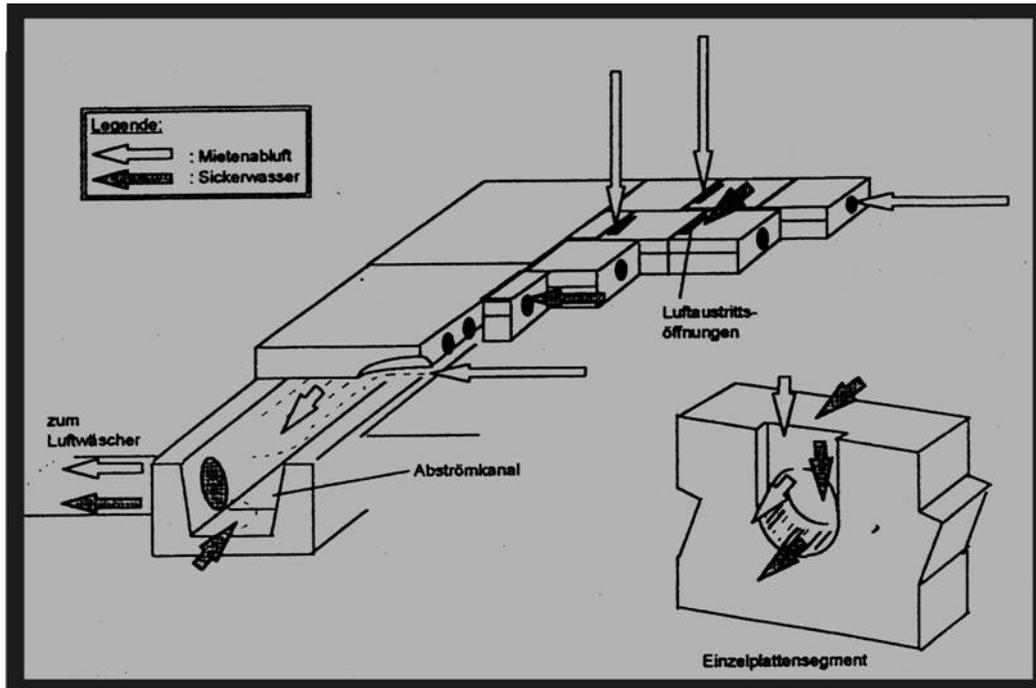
Construction of the ventilated slab floor (Biokovent – System)
